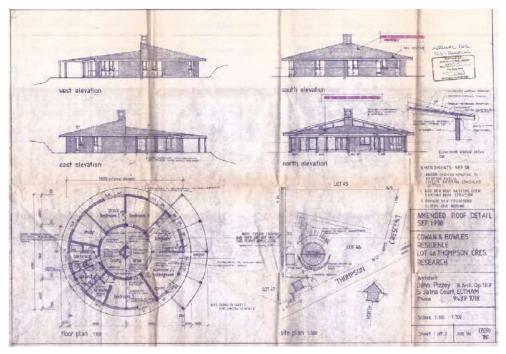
Plans by architect John Pizzey for Cowan and Bowles residence at 57 Thompson Crescent, Research, 1998. (Source: BP)
